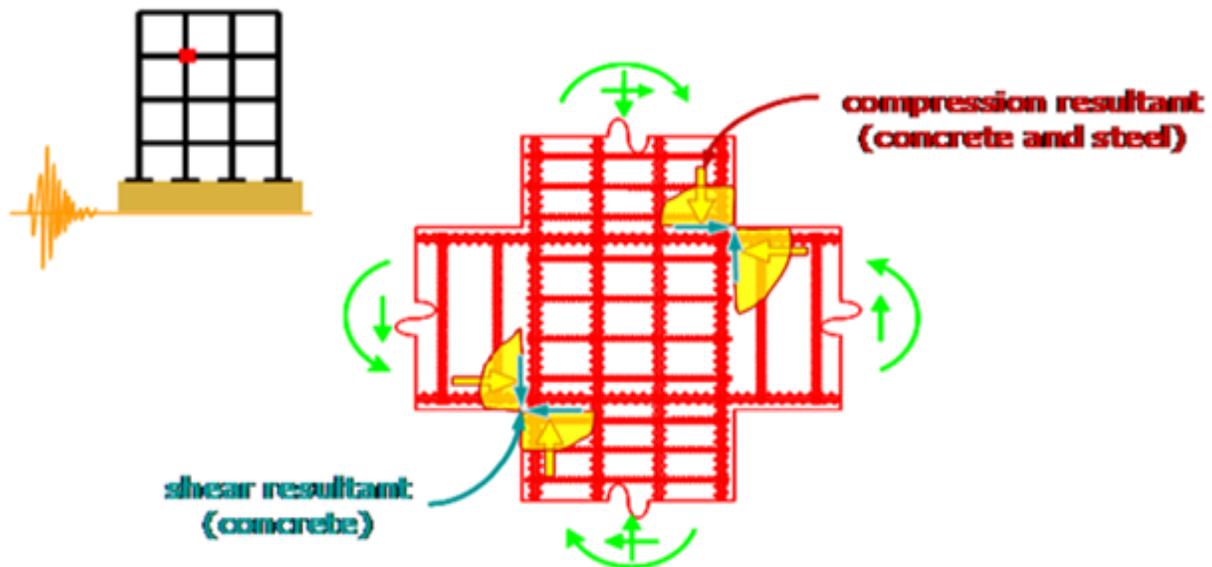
Earthquake Loading on beam-column Joints
